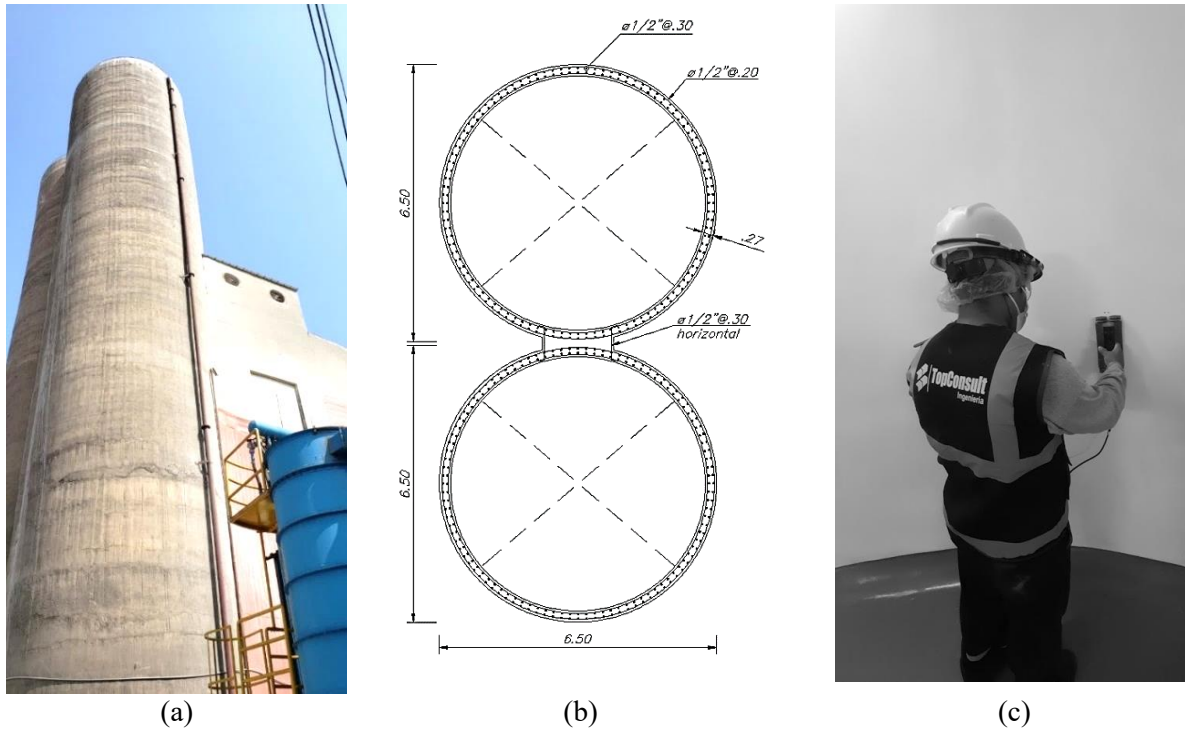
Existing RC Silos. (a) General view. (b) Silos cross-section. (c) Steel reinforcement scan with X-Ray equipment.
